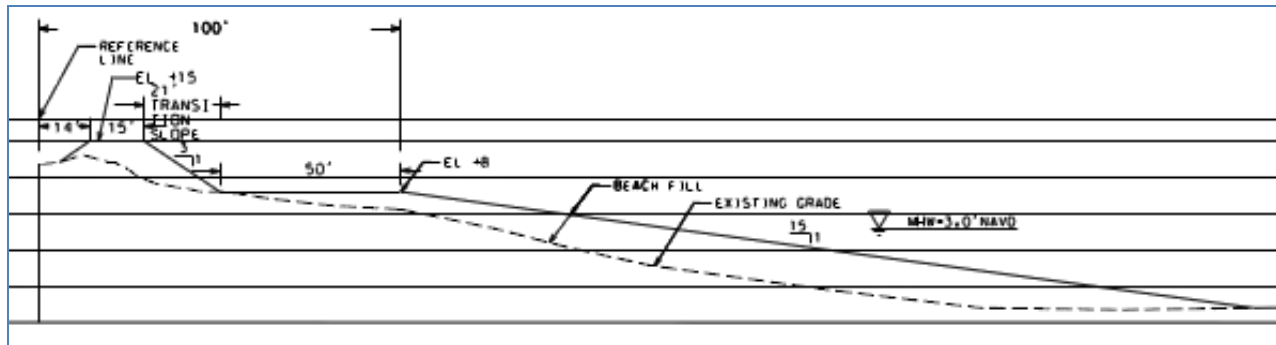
Typical Beach fill Section Station 0+00 to 9+00
